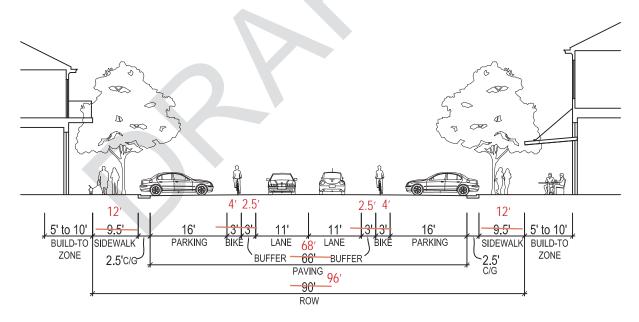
Street Type 1: Town Center Cross Section [Update pending]
